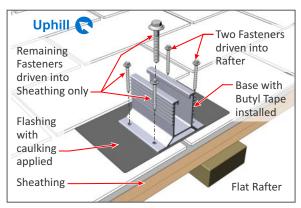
Deck Mount into a Flat 2x4 or TJI. Full Span.
